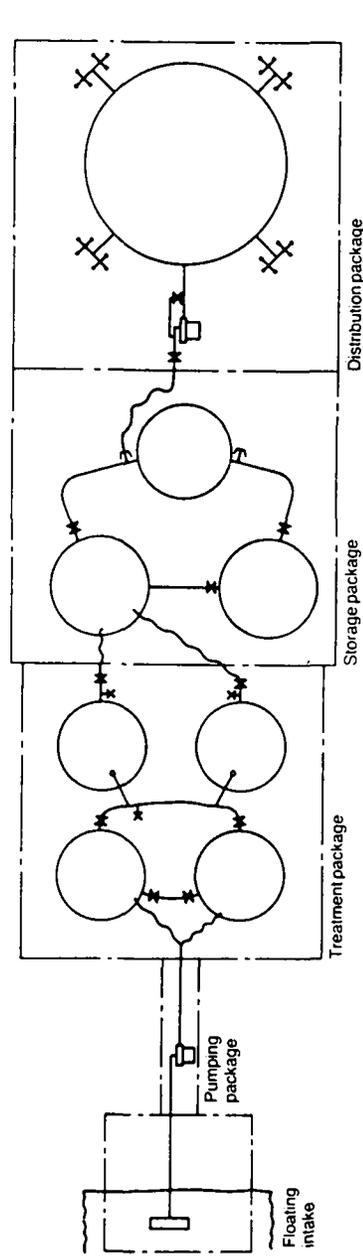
Plan of the Oxfam/Imperial College water treatment system
